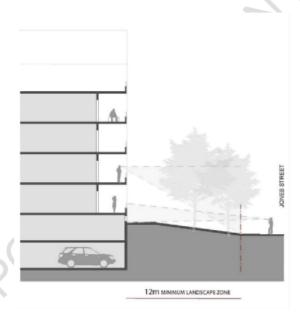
Indicative section at precinct eastern boundary, adjoining Jones Street
